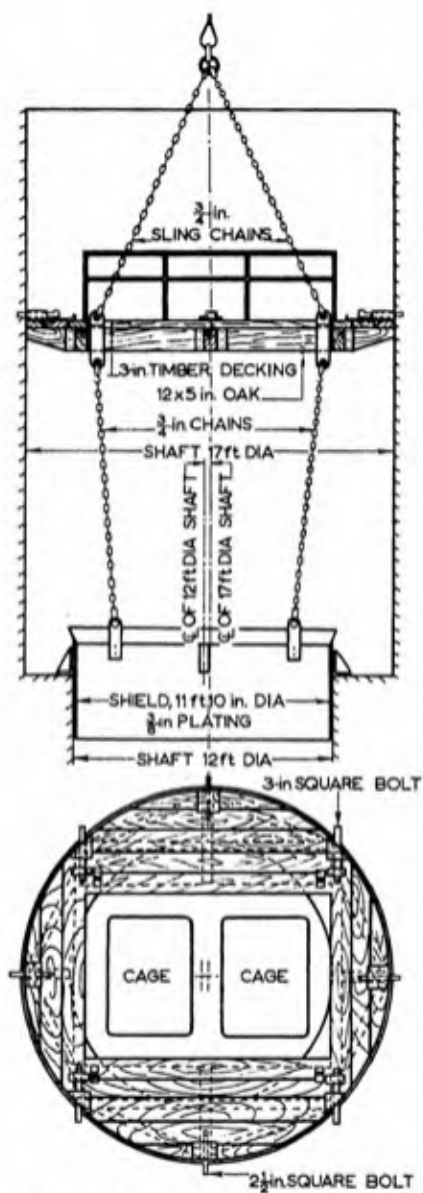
BRICKING-SCAFFOLD AND SHIELD USED FOR WIDENING SHAFT (LATHAM)
